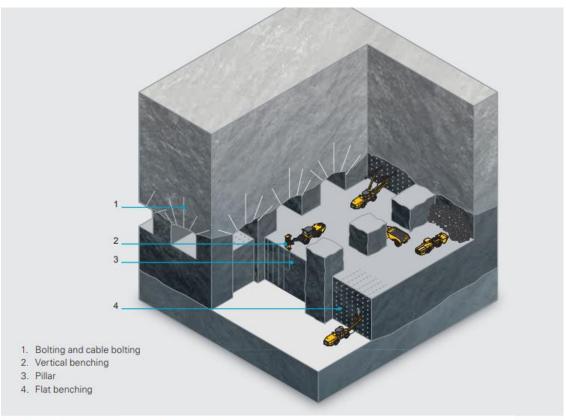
The illustration shows a flat horizontal orebody and typical mining activity.
